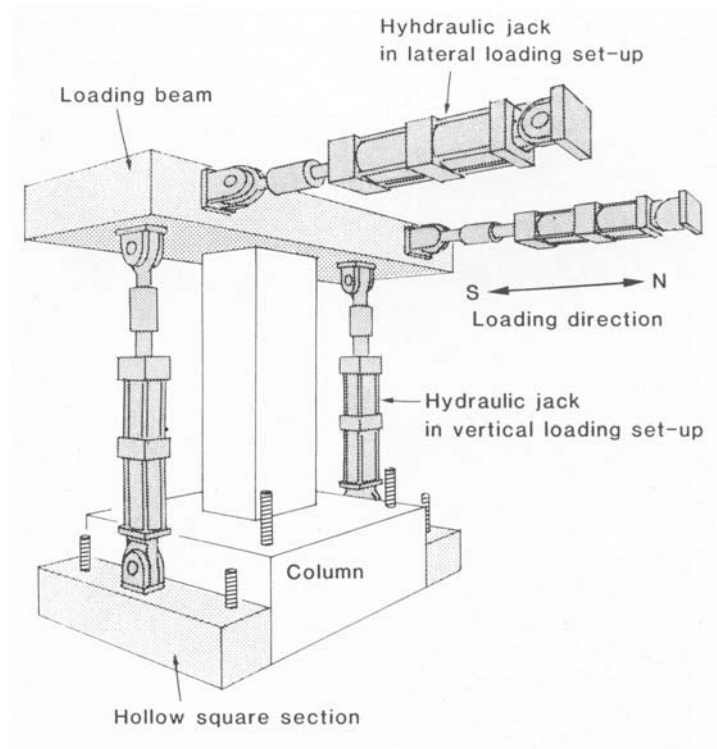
Test setup (Ozcebe and Saatcioglu, 1987)
